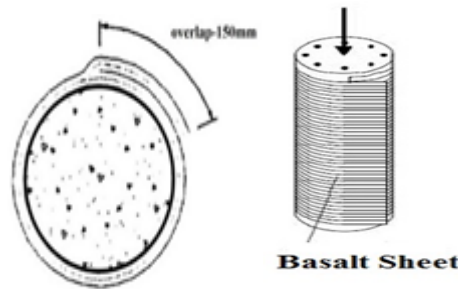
Wrapping of Sheets Fig 6. Testing of specimen
